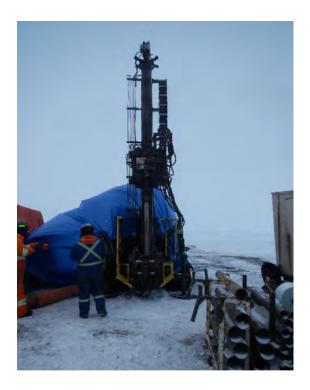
Drilling Conditions at BH18-M002, April 2018
